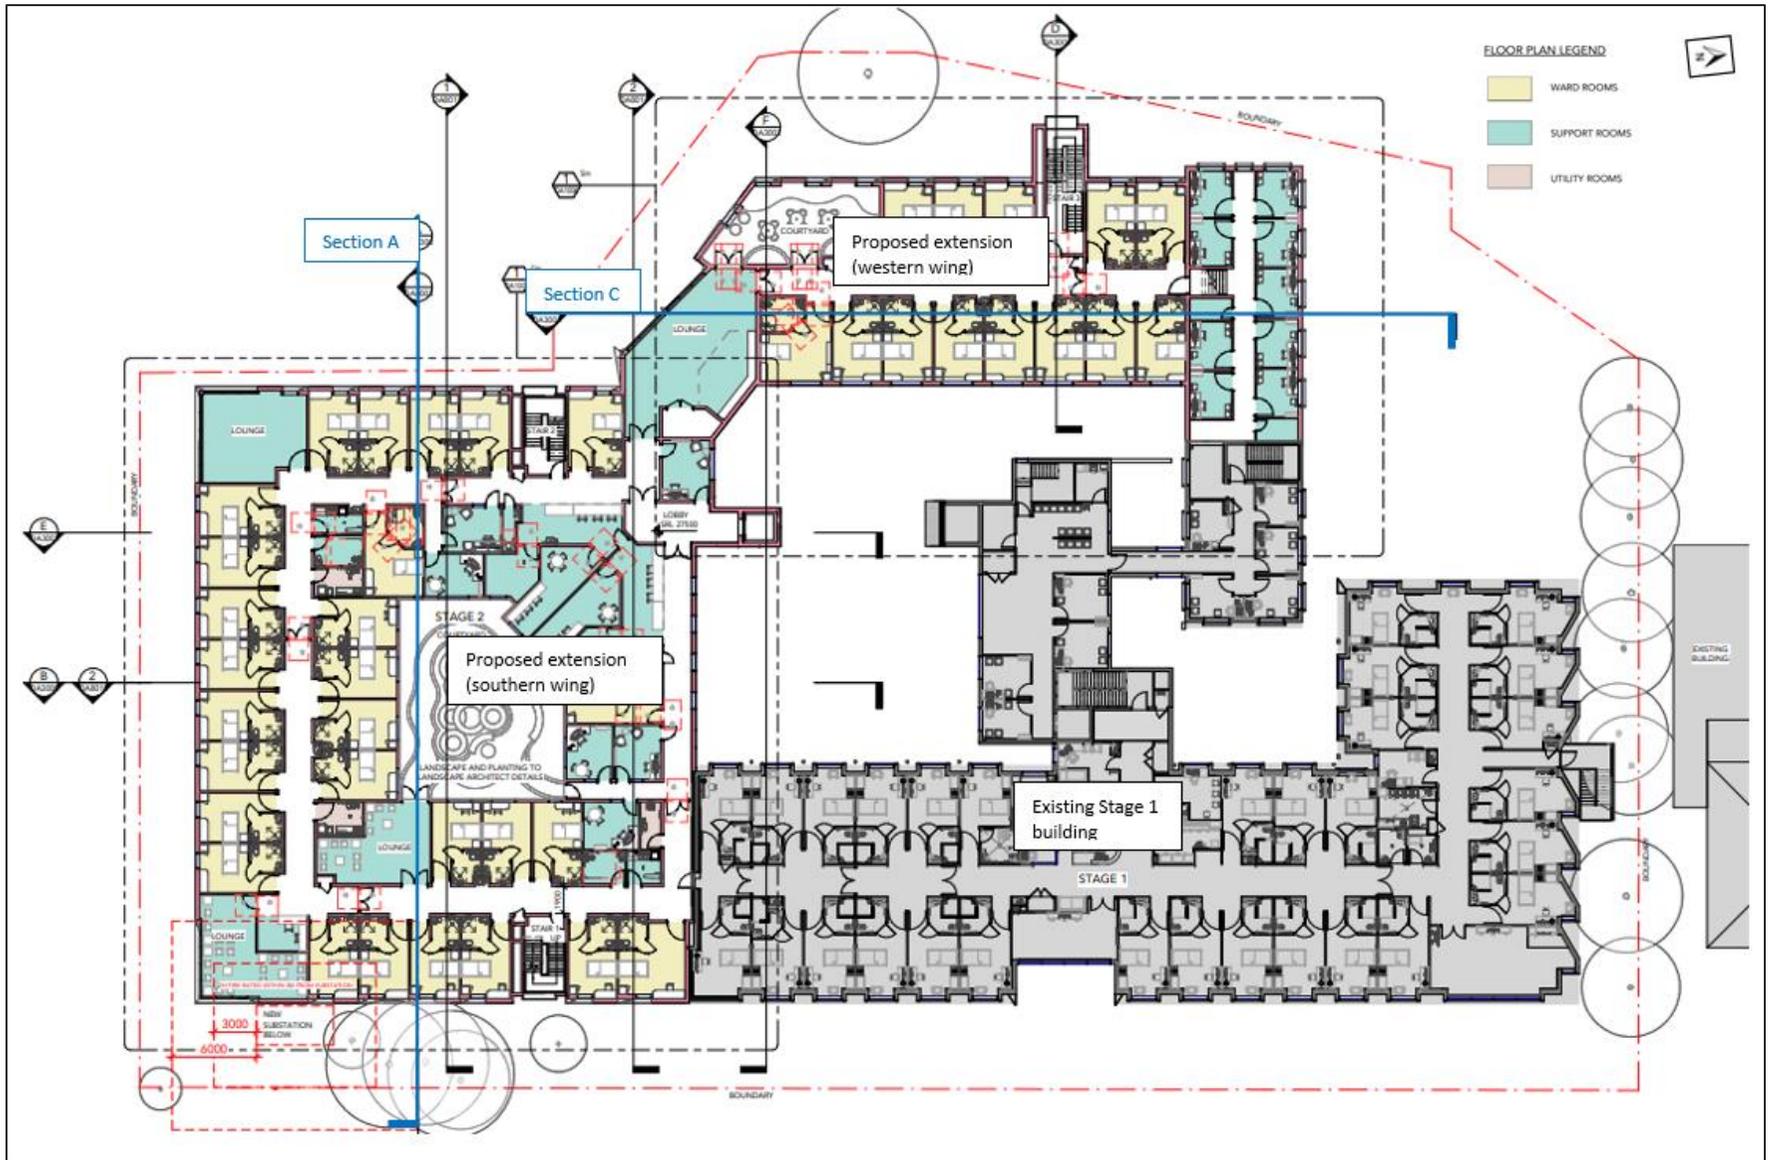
| Proposed first floor level (Source: Applicant's SRtS)
